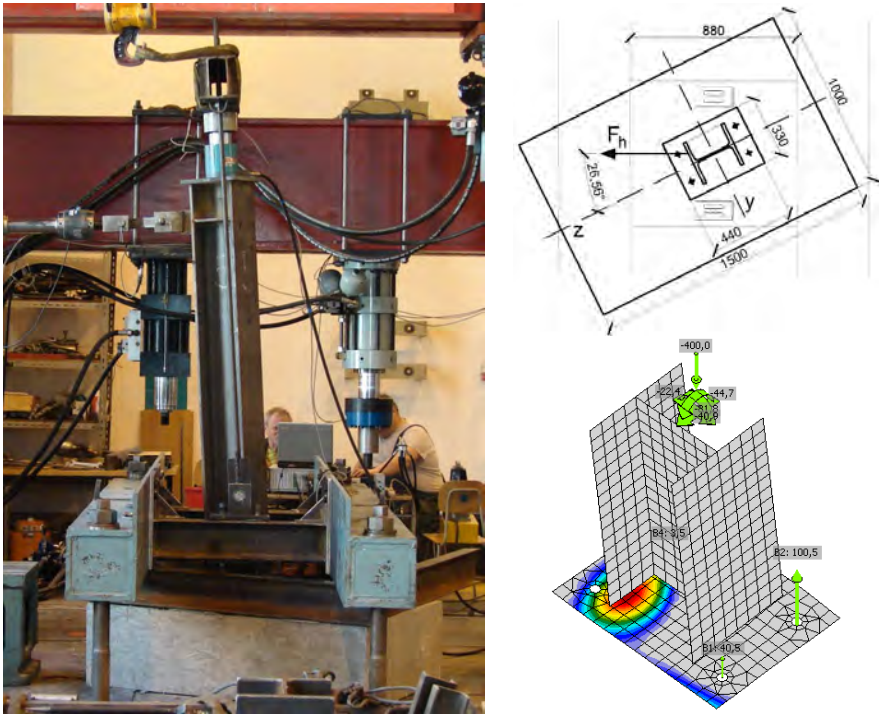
Test set-up: elevation and plan drawing; CBFEM model
